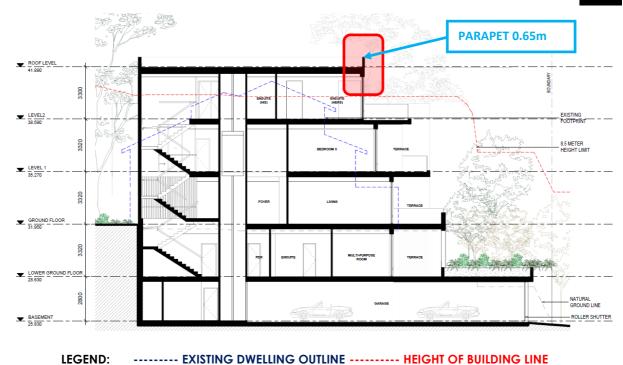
Figure A. Section drawing – with existing dwelling outline & site HOB line.
